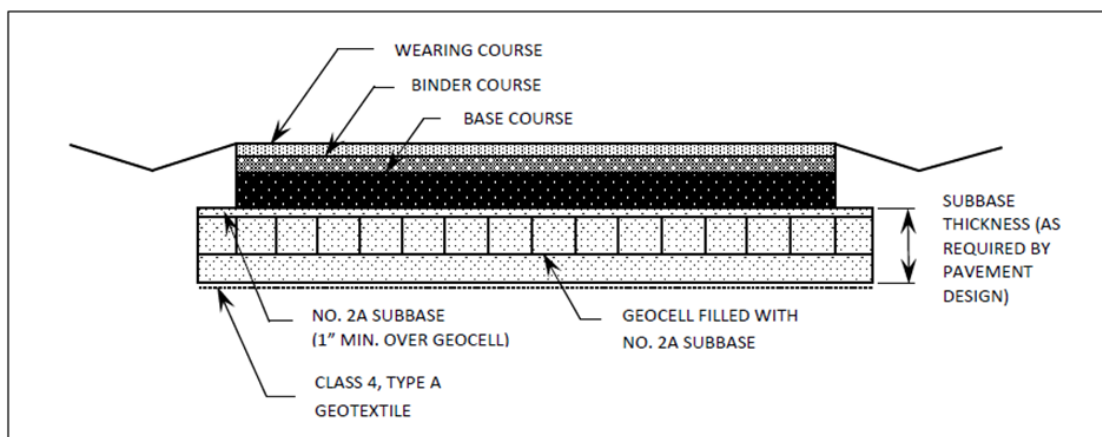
Typical pavement section with geocell layer (adapted from PennDOT GDM, 2018).
